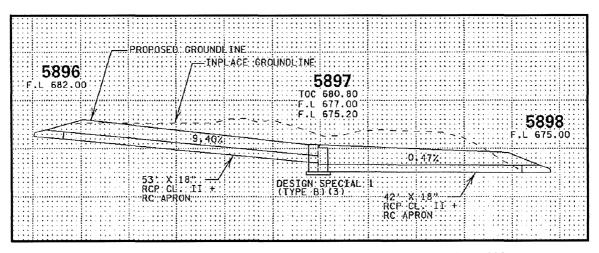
PRE-CONSTRUCTION PROFILE OF STORM SEWER 5896 TO 5898
